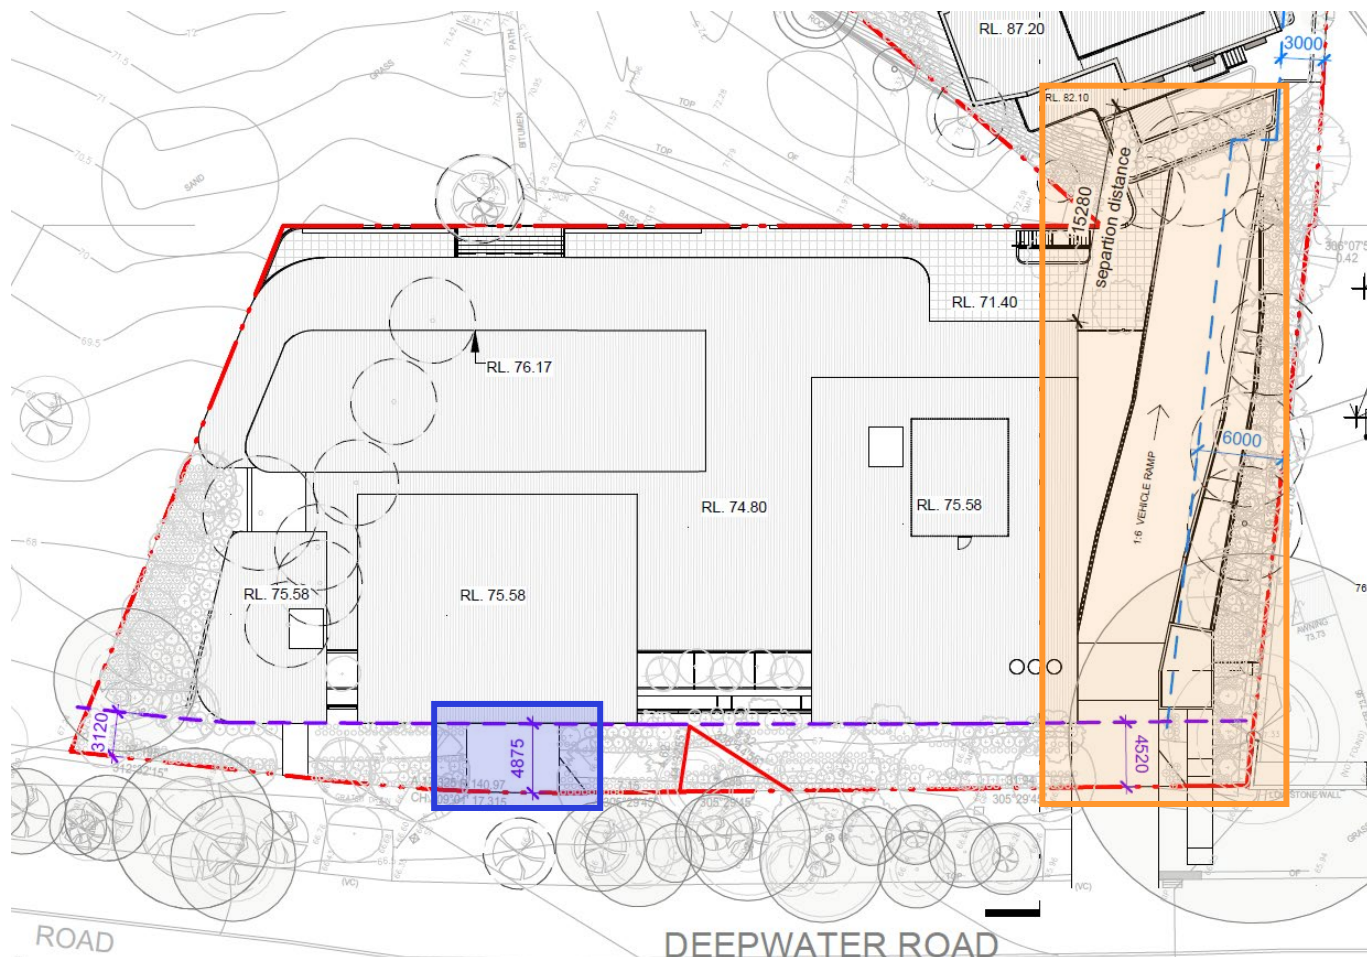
Clubhouse vehicular access shaded in blue and ILU vehicular access shaded in orange
